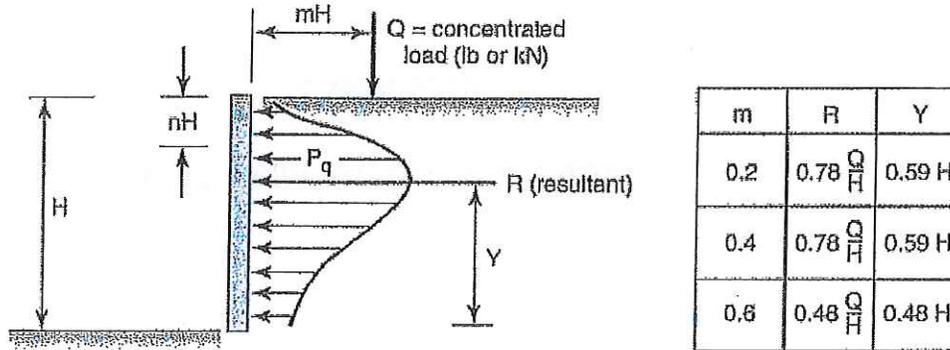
Pressure distribution against vertical wall resulting from point load, Q.
